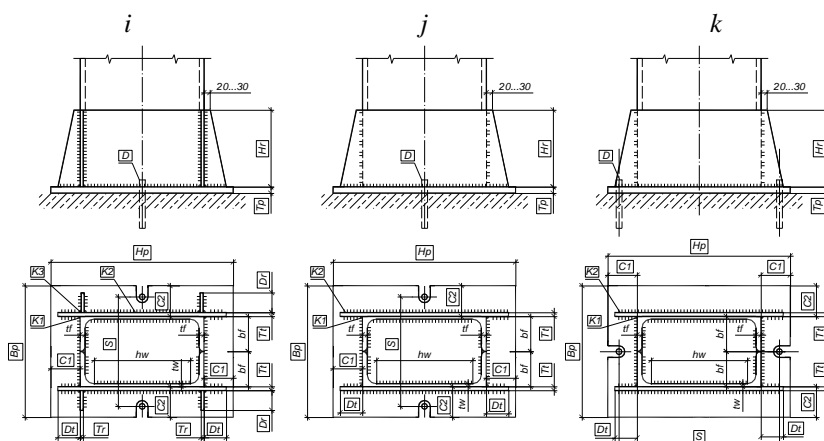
Types of designs for nominally pinned column bases with wing plates and cantilever stiffeners
